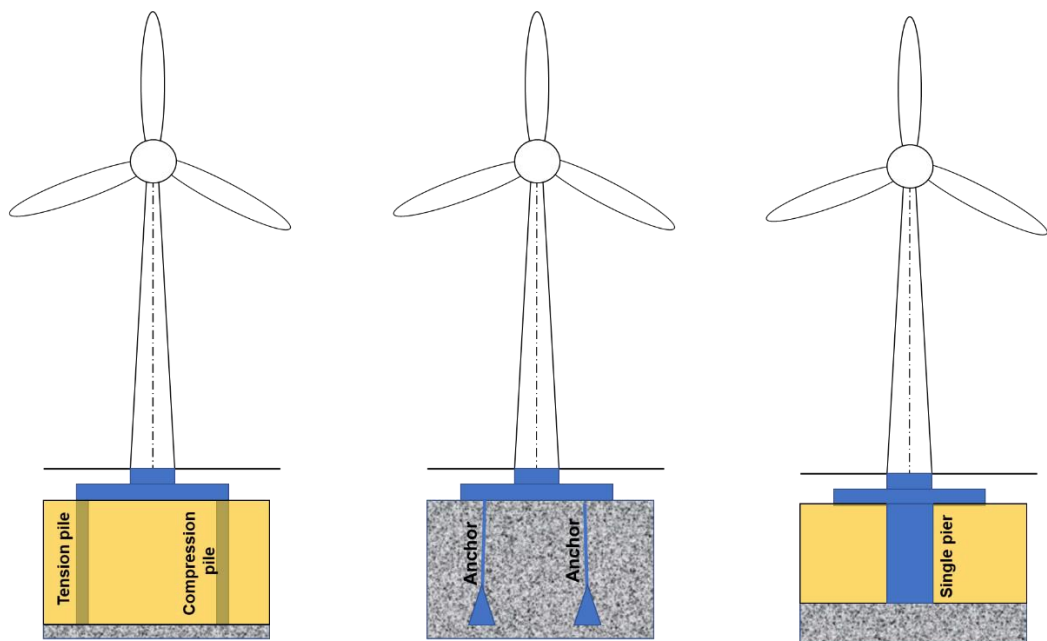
Different foundation types – a) spread footing supported by piles, b) spread footing anchored to the bedrock, c) footing supported by single pier
